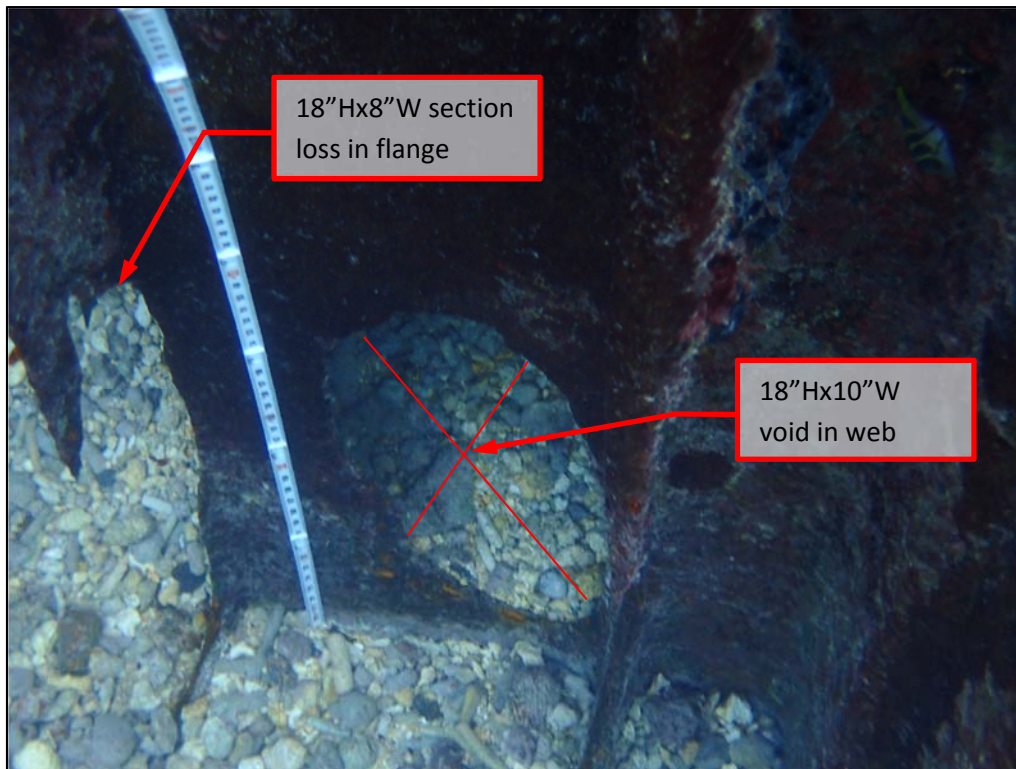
Berth 1. An oval shaped opening in the web of the H-pile and section loss in the flange at the northwest corner.
